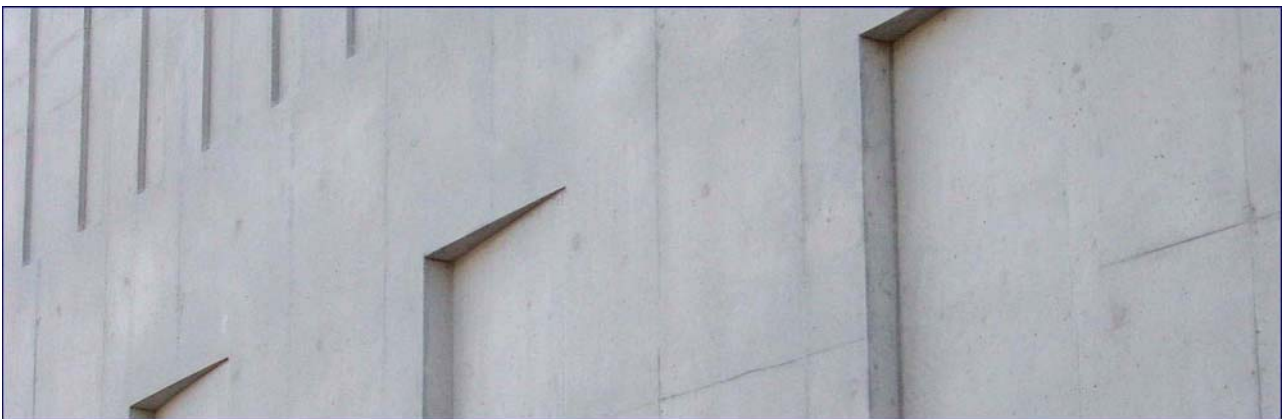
A Concrete Wall for Tokyo Circular Road No.8 (Tokyo, Japan)
